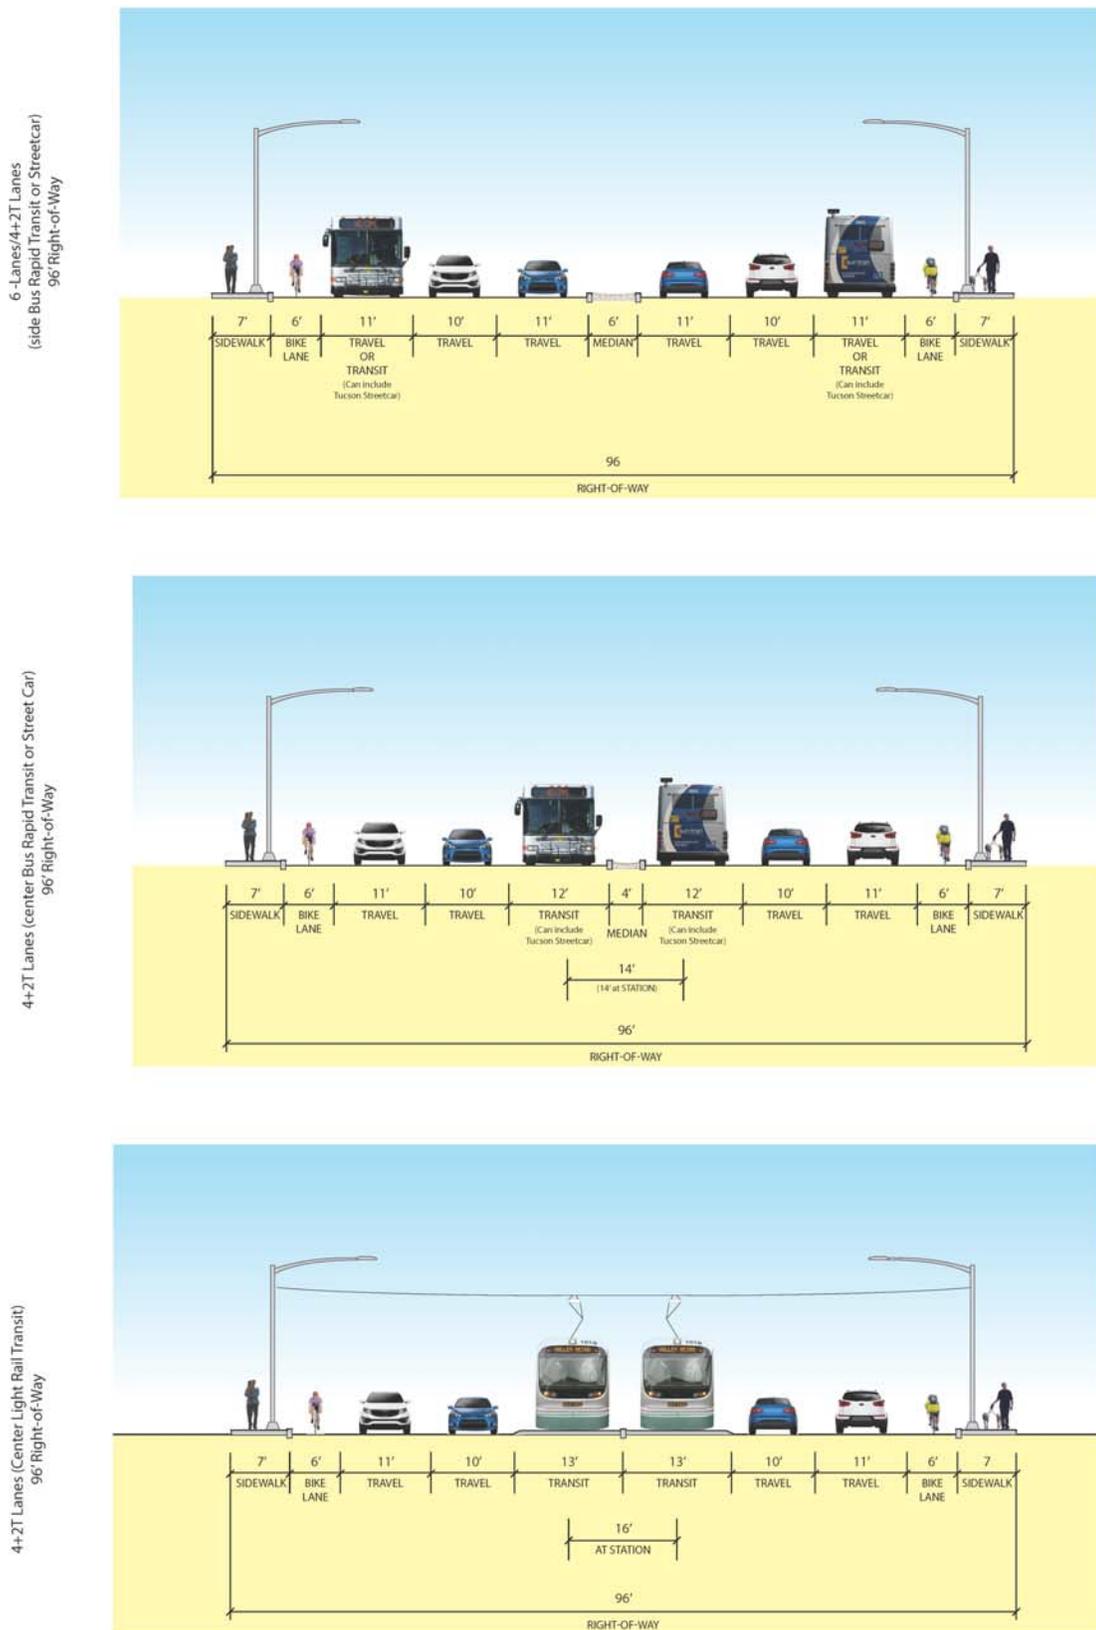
Plausible Street Configurations -- 96' Right-of-way Widths
